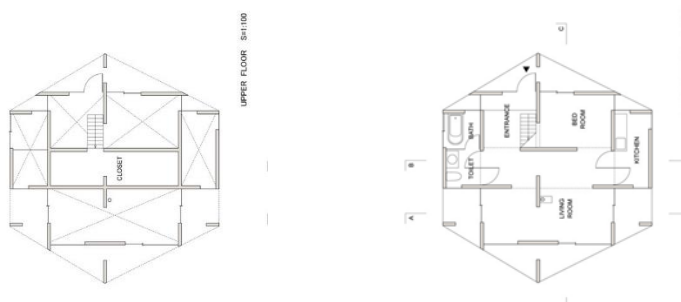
W-House / Uchida Architect Design Office (<http://www.archdaily.com/361396/w-house-uchida-architect-design-office/>).
